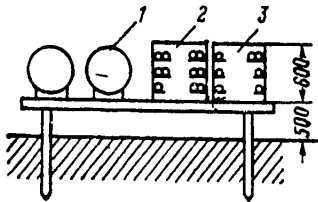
Schematic drawing of the combined laying of cable ducts with pipelines:
